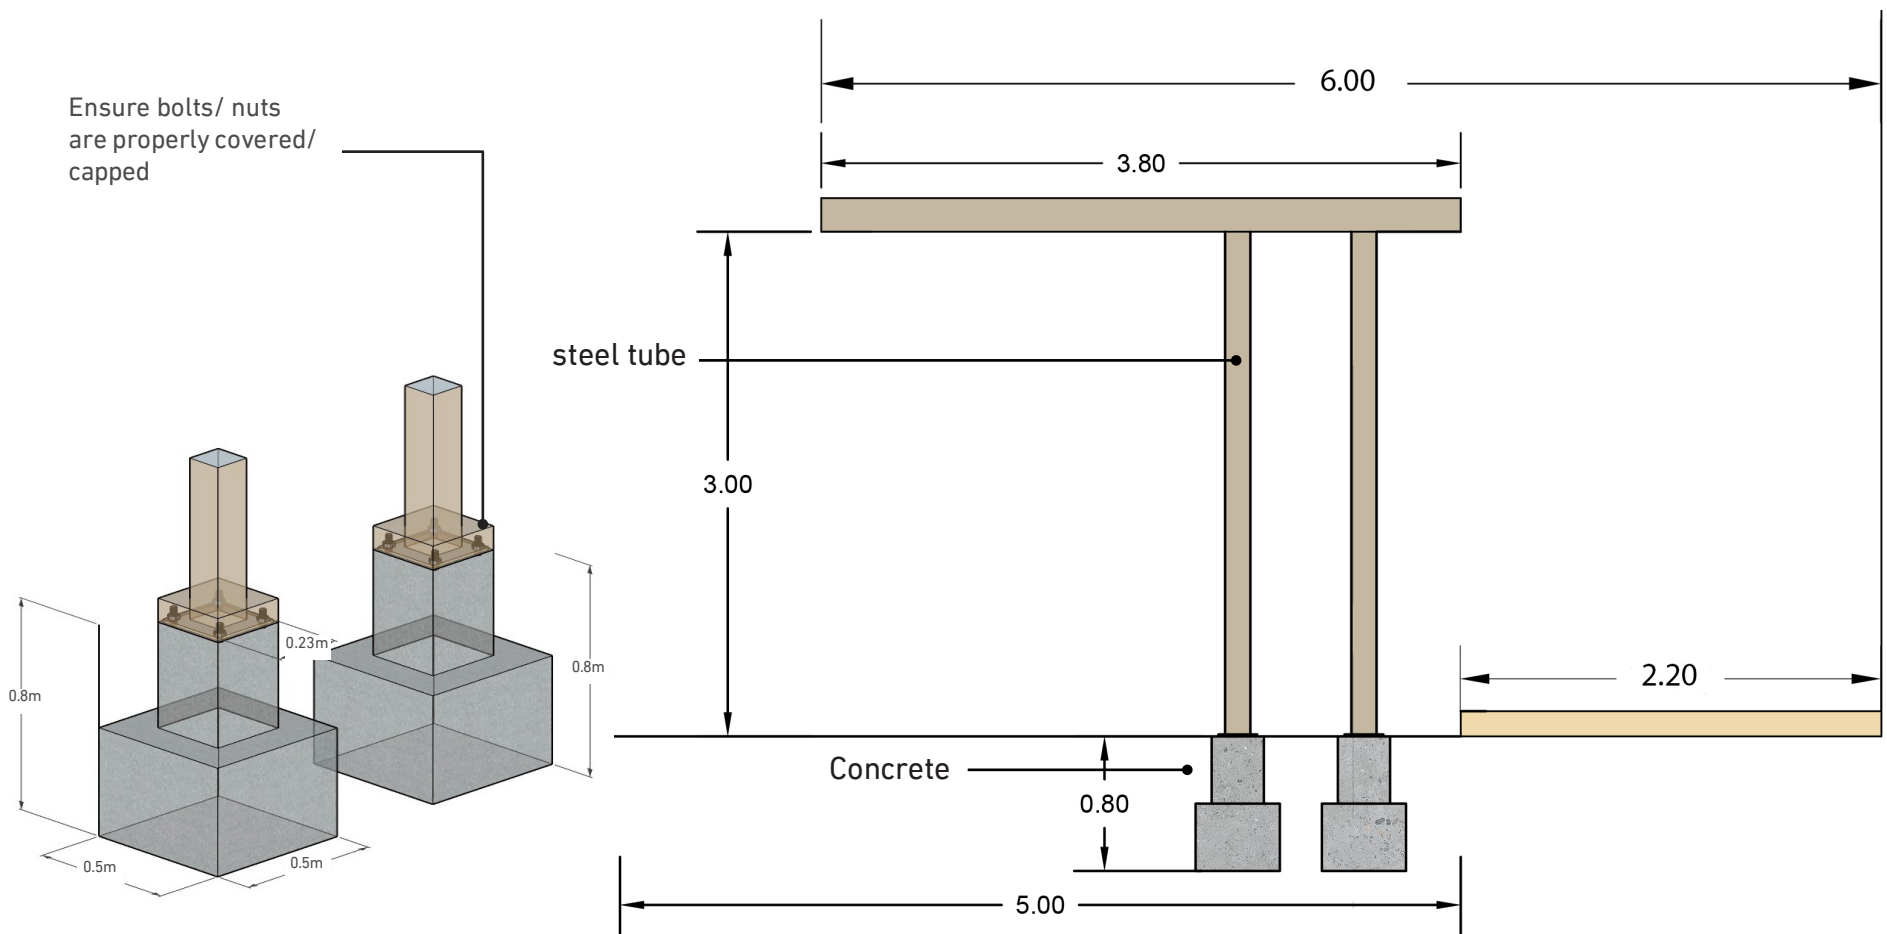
Wooden Panel Shade structure for Building Car Park Section
